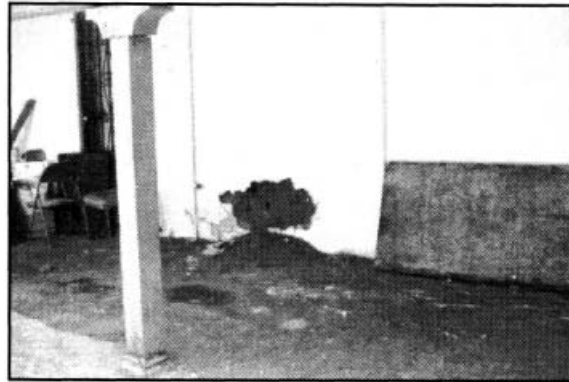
Vicente Sanchez Adobe. Moisture damage to an exterior wall in the south section of the building.
